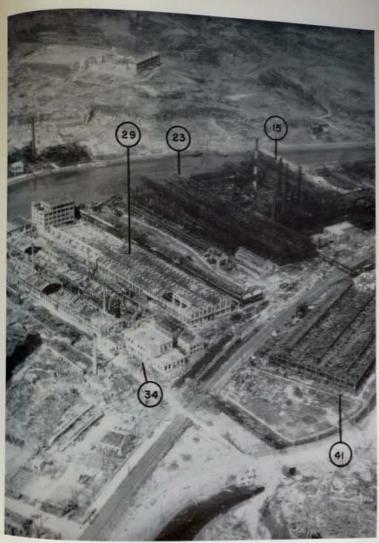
Group 12. General view looking south. Brick kilns in background.
